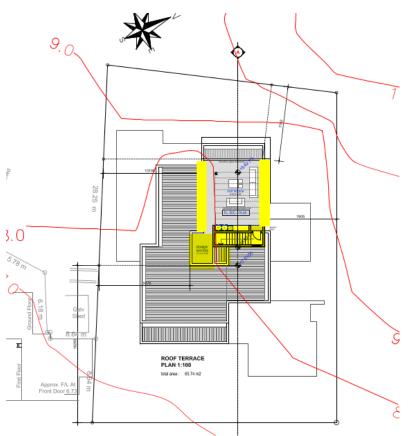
Yellow highlight showing enclosed area of the roof terrace above permitted height
